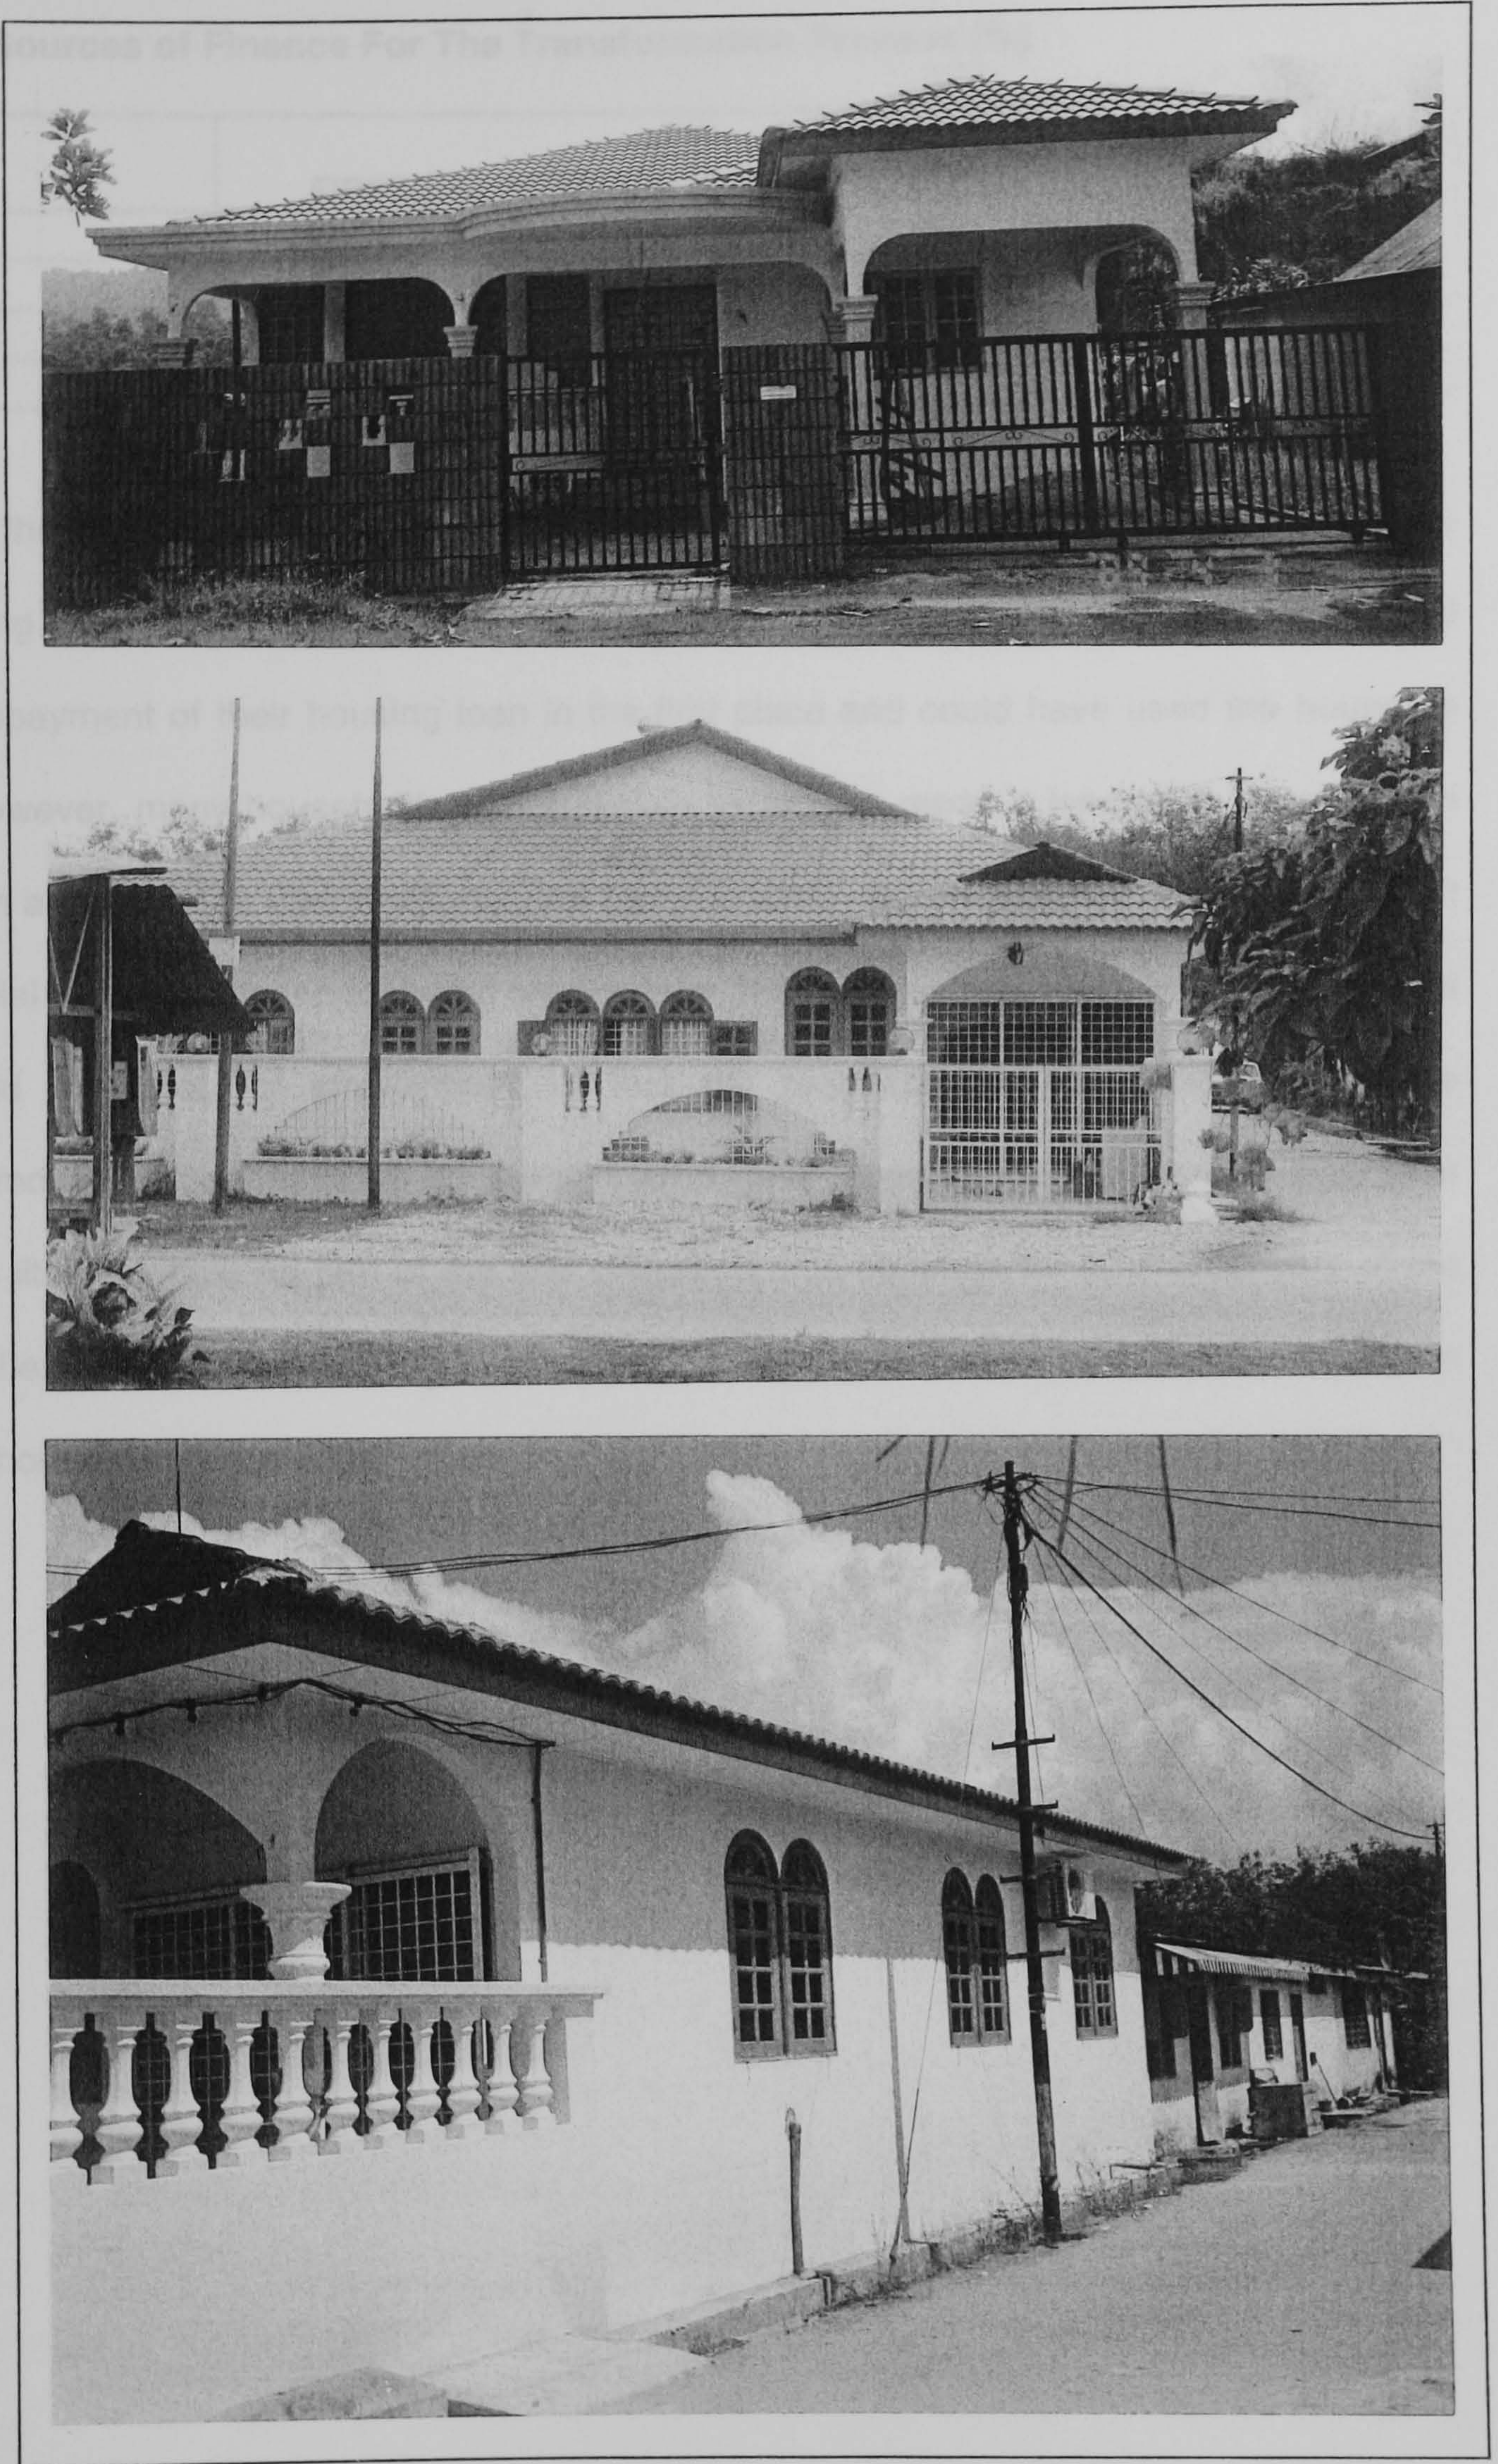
Examples of Newly Built Houses After Complete Demolition of Existing Units
